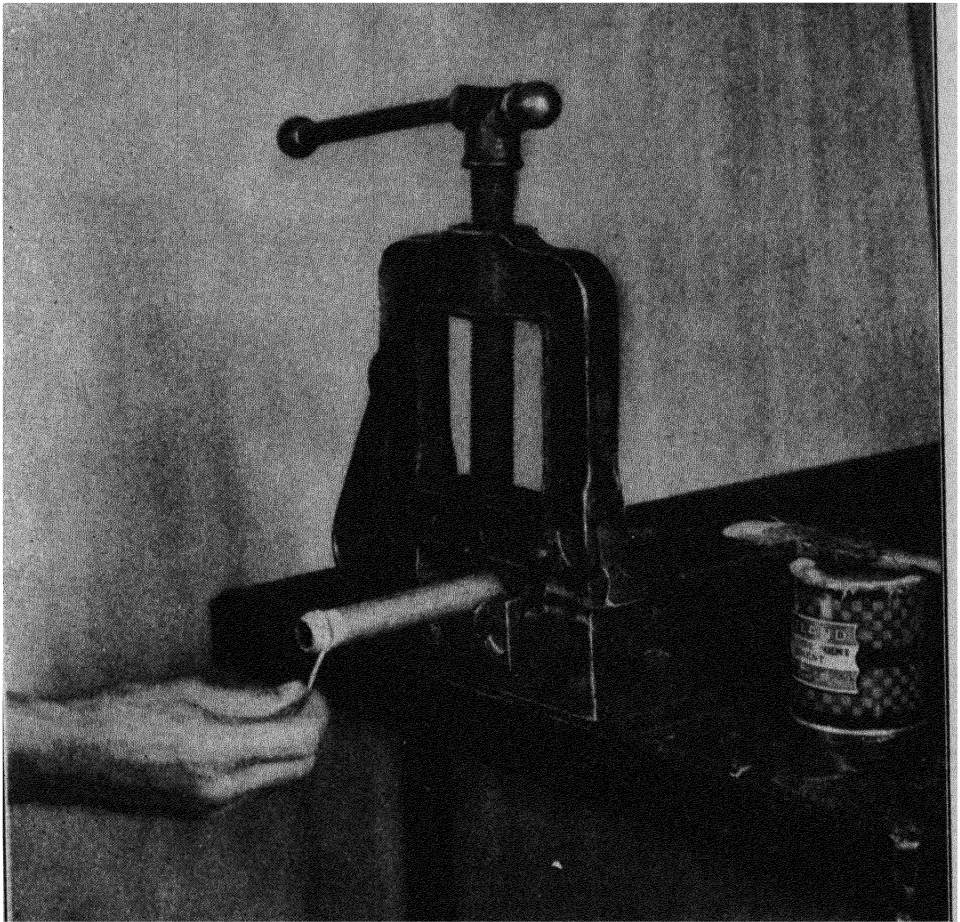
Preparing the pipe threads for the fitting or valve. Pipe joint compound is first placed on the threads and then a short piece of candle wicking may be wrapped on the threads to insure an absolutely tight joint.
